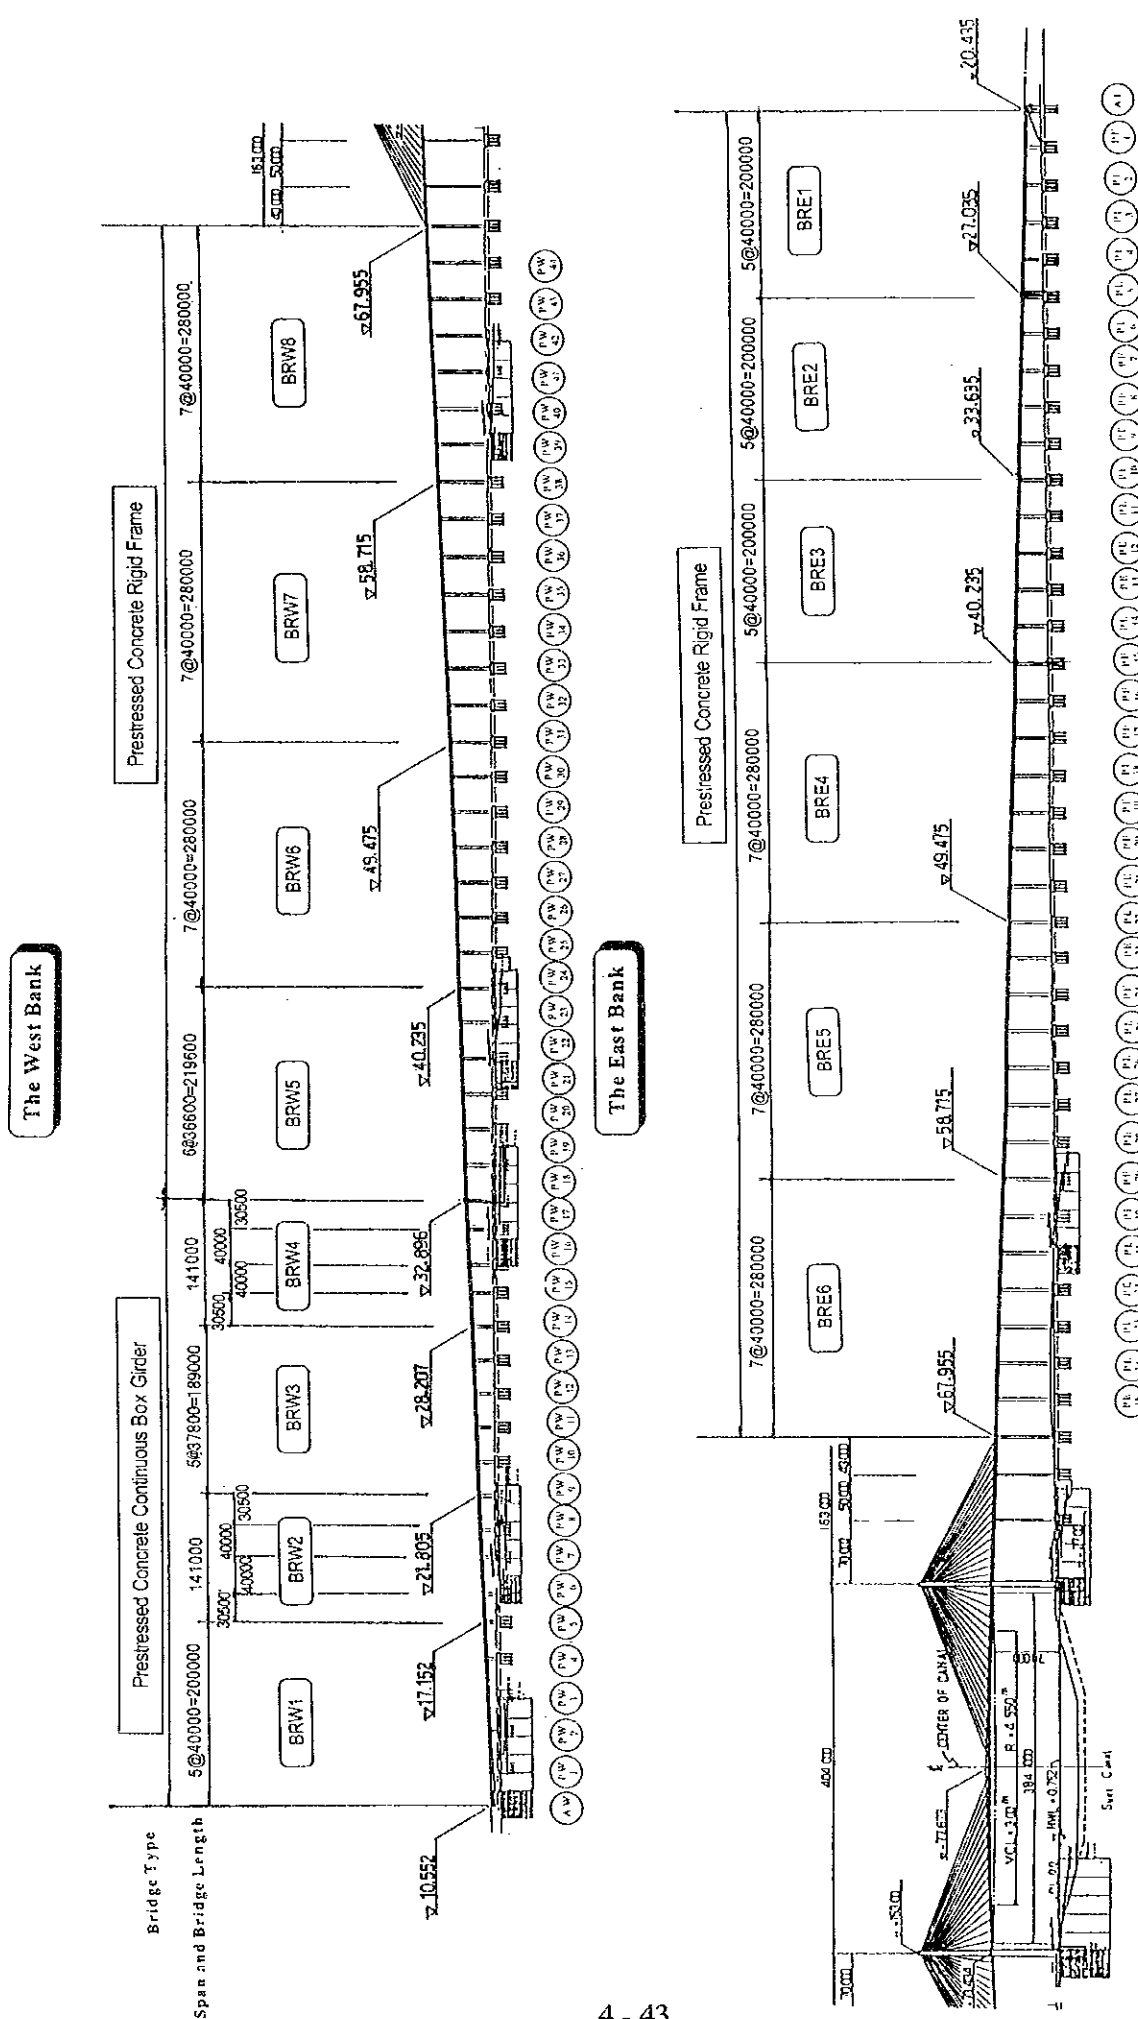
General View of Suez Canal Approach Bridges
